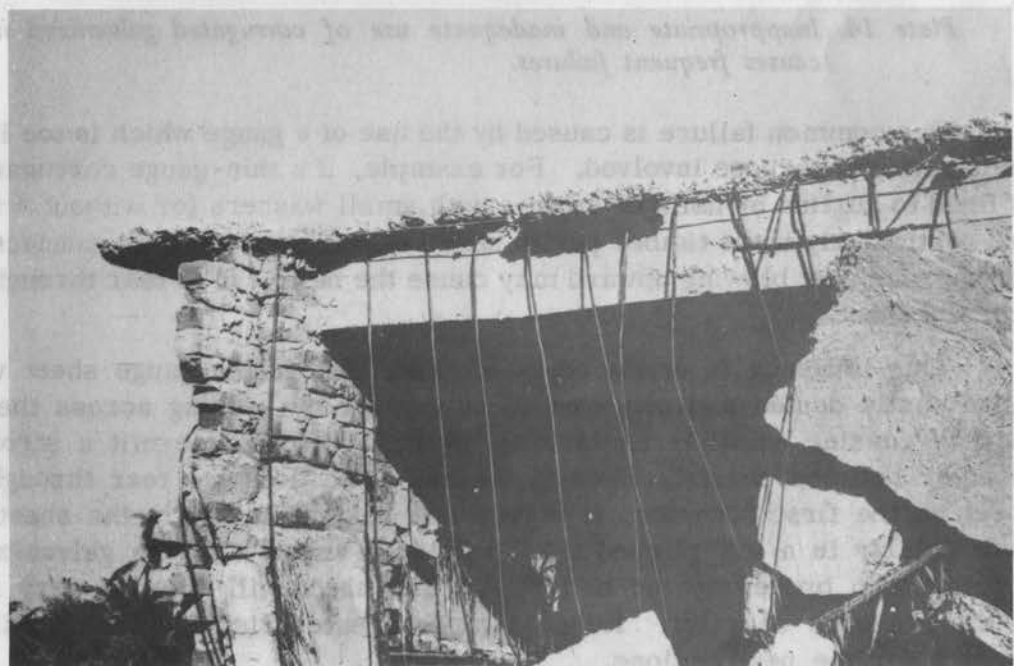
Corrosion, expansion, cracking and final failure under extreme loading of cyclonic wind forces
